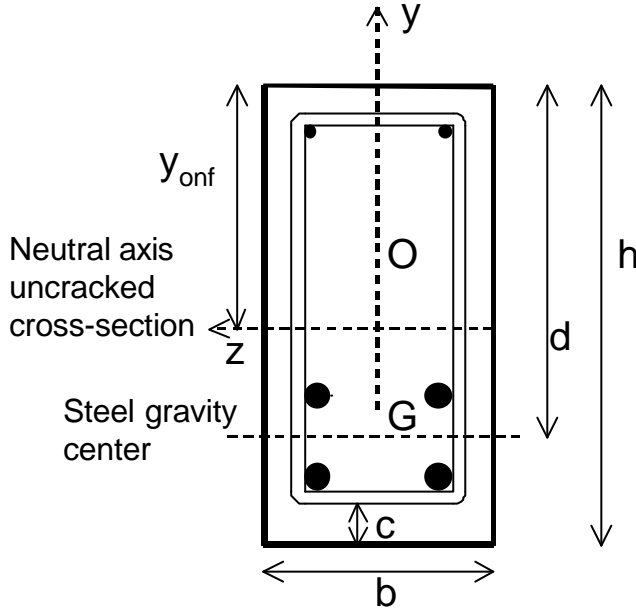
Geometrical parameters for the cross-section of a reinforced concrete beam, y_{onf} correspond to the position of the neutral axis calculated before cracking
